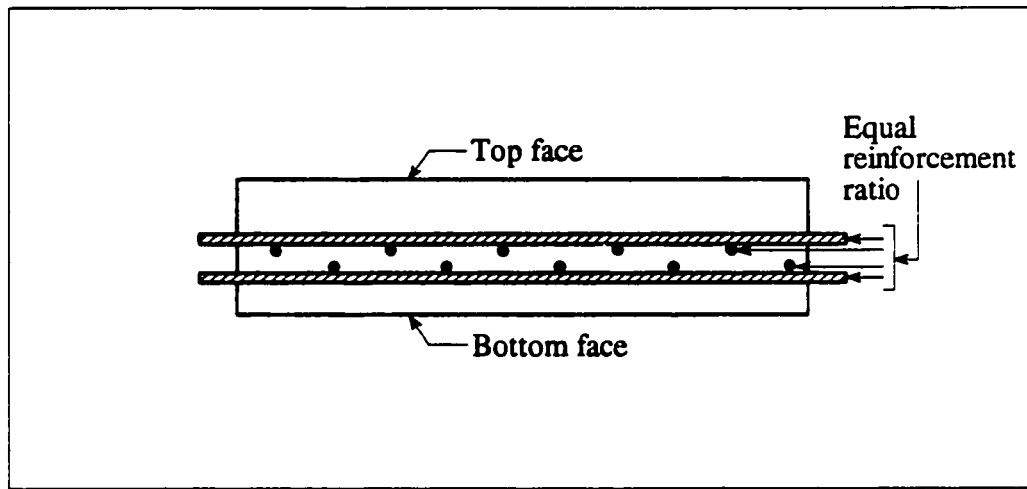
Deck slab reinforcement requirements (transverse section)
